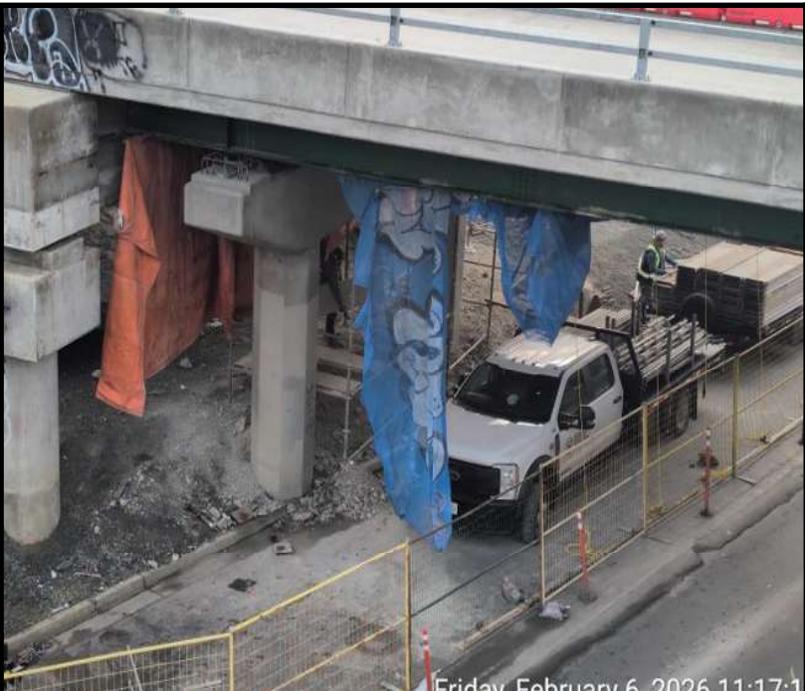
Dismantling of scaffolding prior to old bridge support removal, looking southeast.
